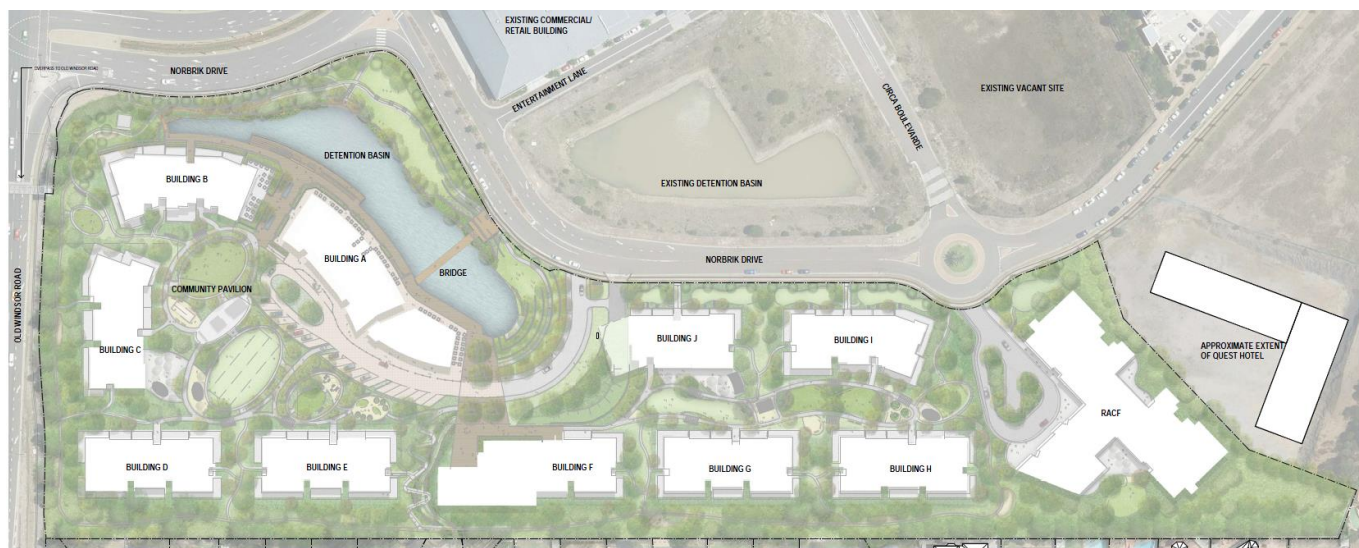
Seniors Housing Masterplan layout (Source: Architectural Plans)
